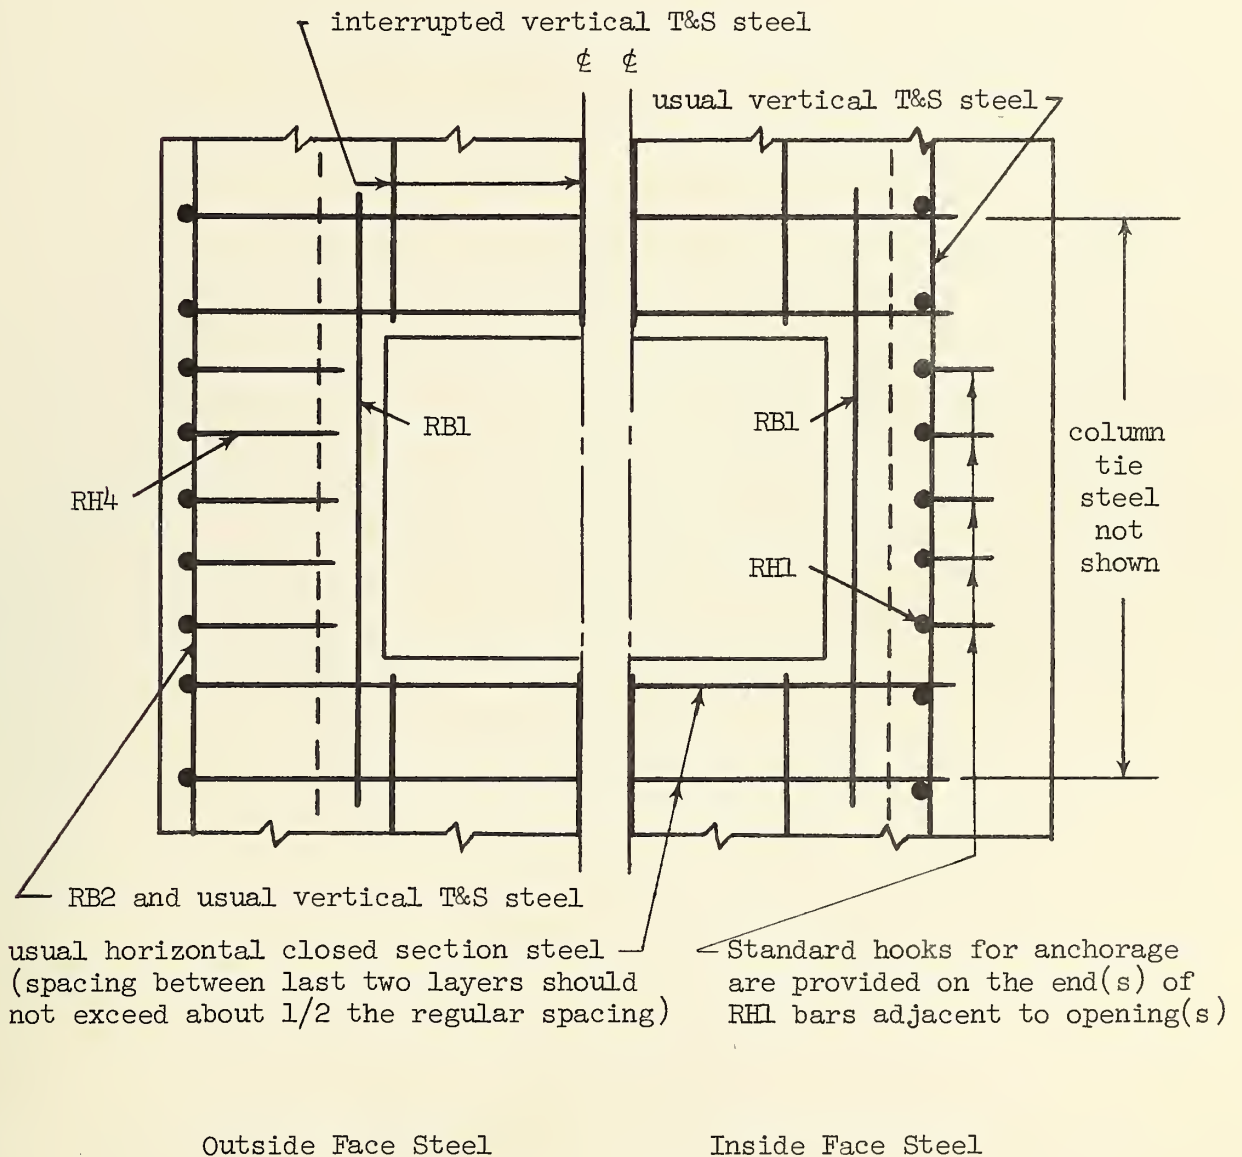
Partial elevation showing schematic steel layout at low stage inlet opening.
